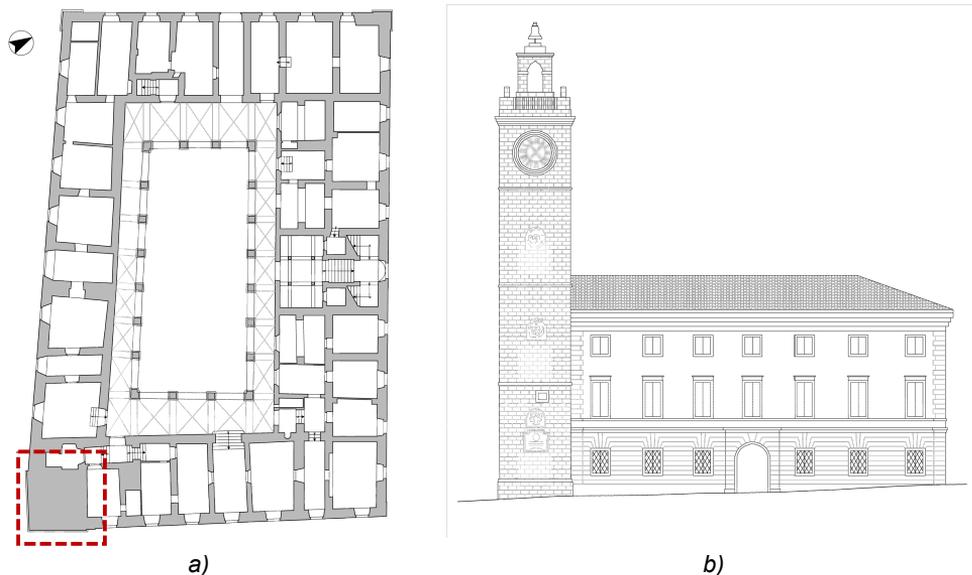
a) Plan view with the position of the tower (dashed rectangle); b) East elevation of the Civic tower-Margherita Palace historic complex
